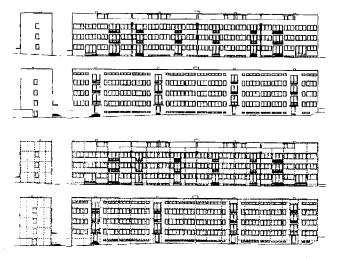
Mies's Weissenhof building elevations and indication of steel frame (by author).
